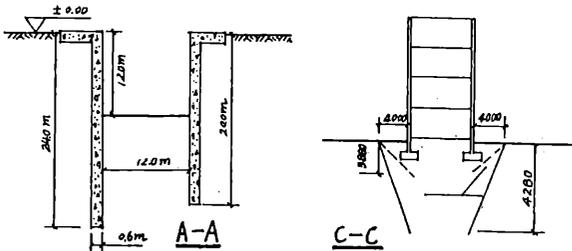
Fig. 5-3 Cross-sections of excavation and building
